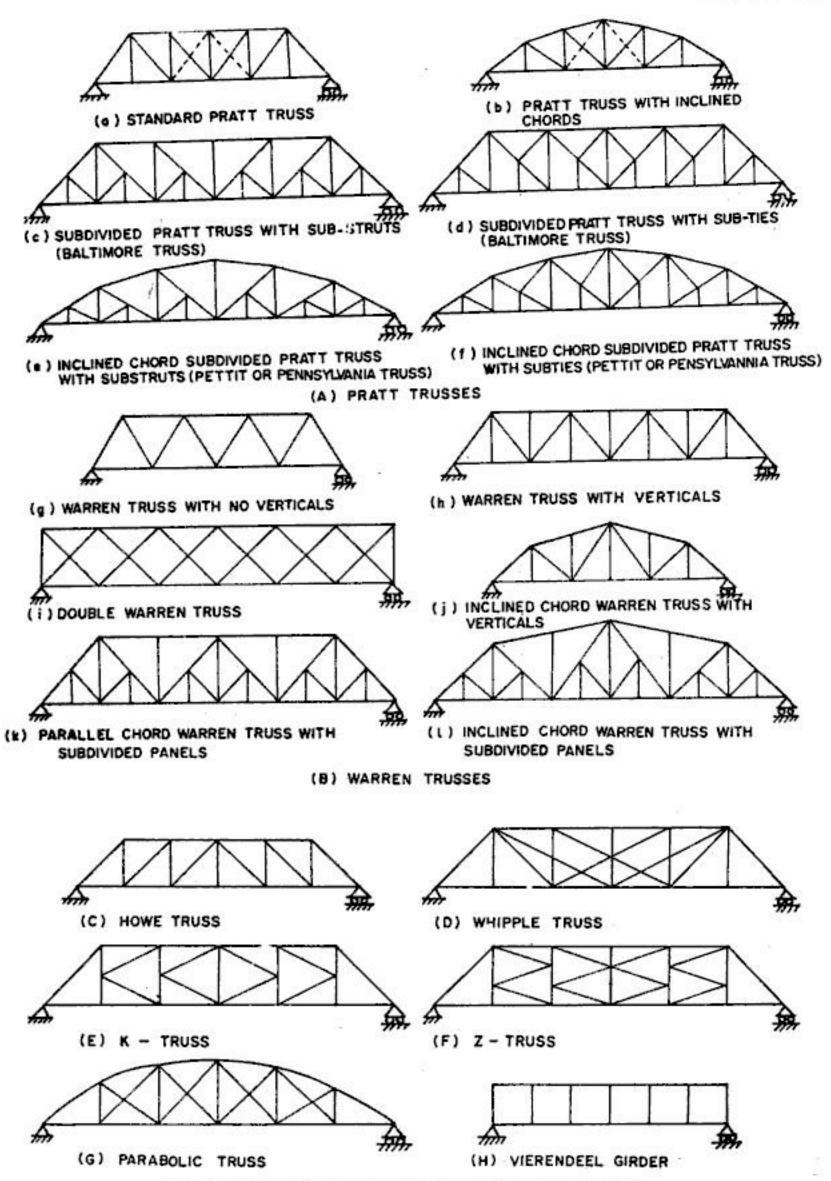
TYPES OF TRUSS GIRDERS FOR BRIDGES
